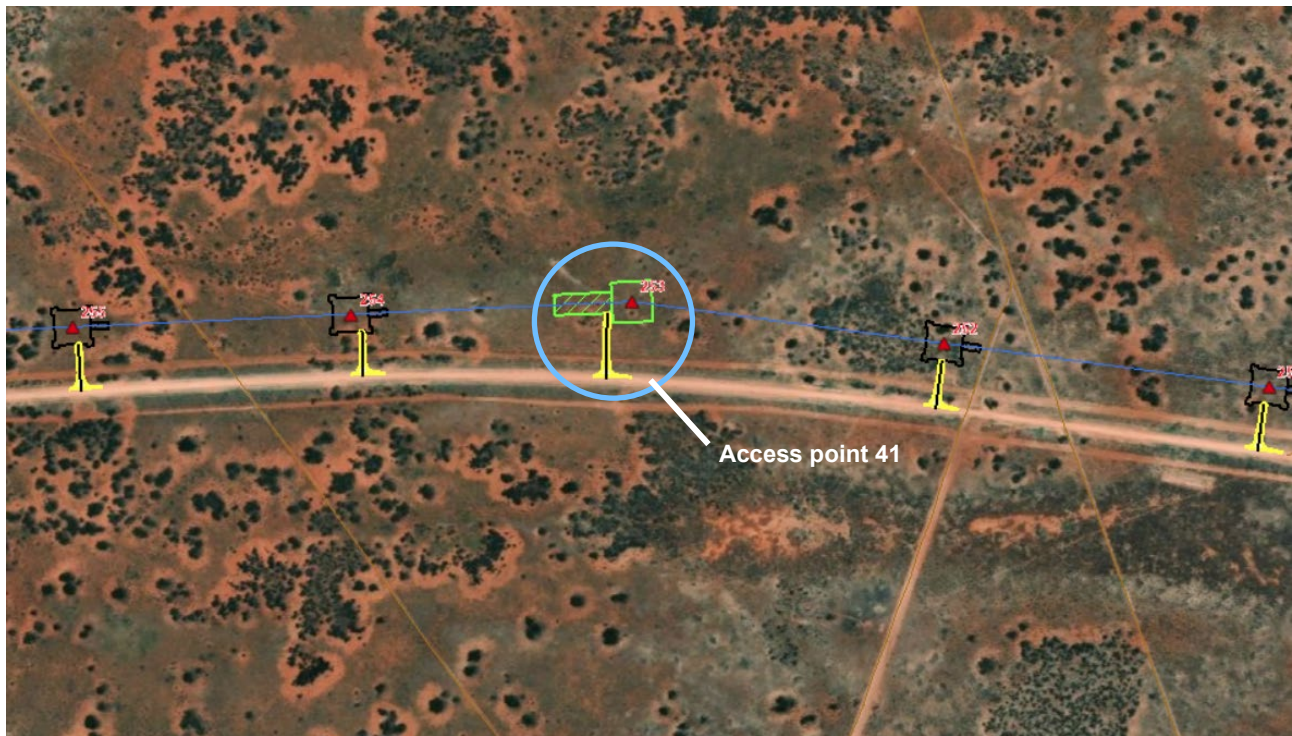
Access point 41 (Renmark Road, tower 253)
